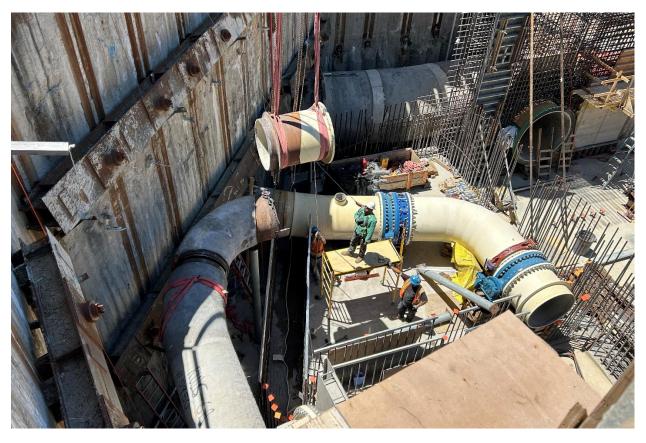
Pipefitter positioning a section of the 36-inch wasteway piping within the valve vault of the UV-CCB Facility with the aid of the tower crane. The photo shows the complexity of the piping and valving in the valve vault.
